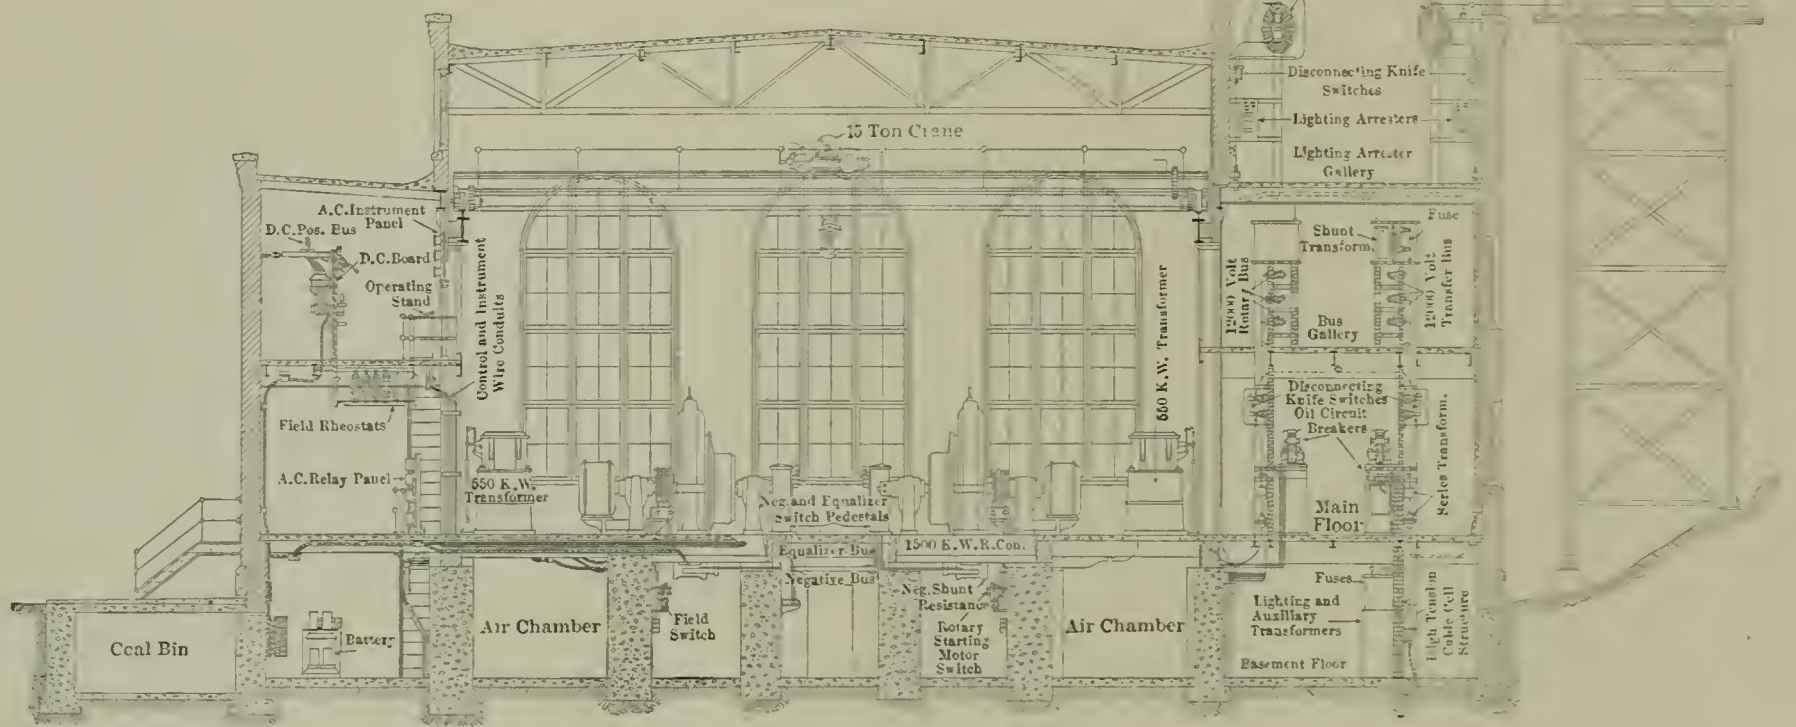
SECTIONAL ELEVATION OF THE SUB-STATION AT WOODHAVEN JUNCTION
